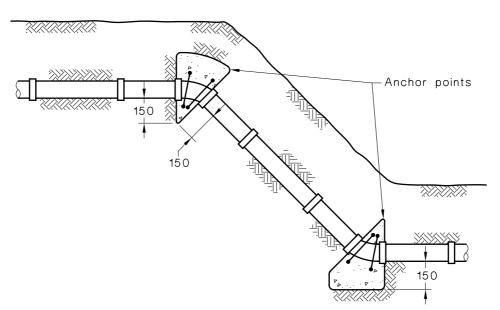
ANCHORING OF SITE STORMWATER DRAINS
